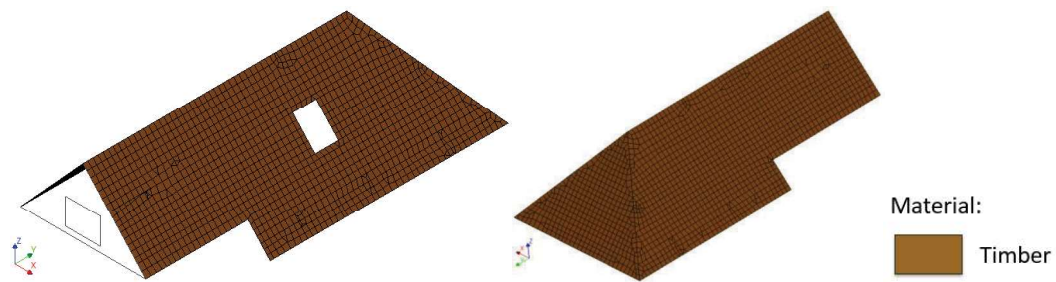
Roof boards. North-East view (left) and South-West view (right).
